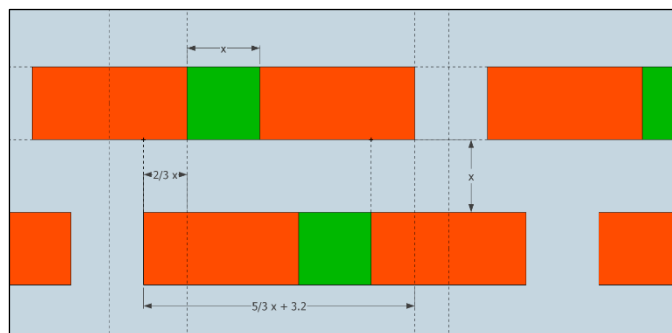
Applying secondary trench on two adjacent primary trenches
